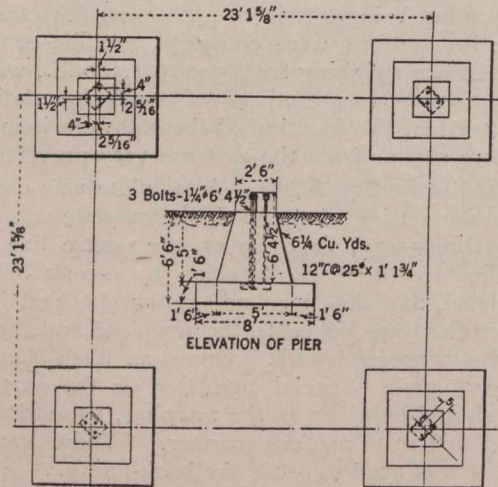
Foundation Plan for 75-foot Heavy Strain Towers.
